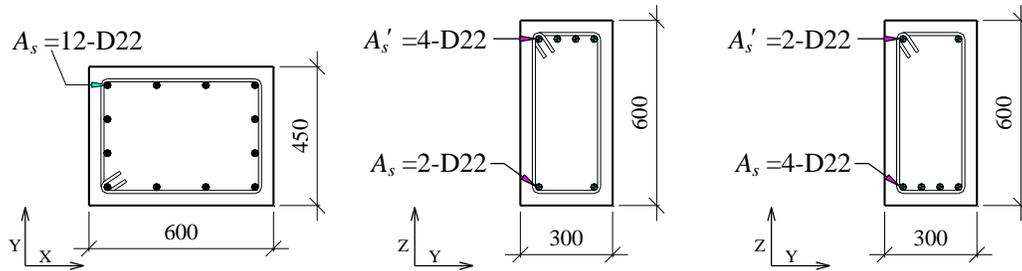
Details of (a) a-a' section; (b) b-b' section; and (c) c-c' section.
